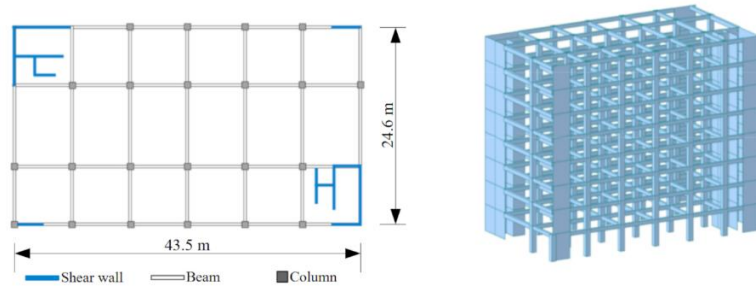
Structural plan and isometric view of SW-F and SW-I buildings
